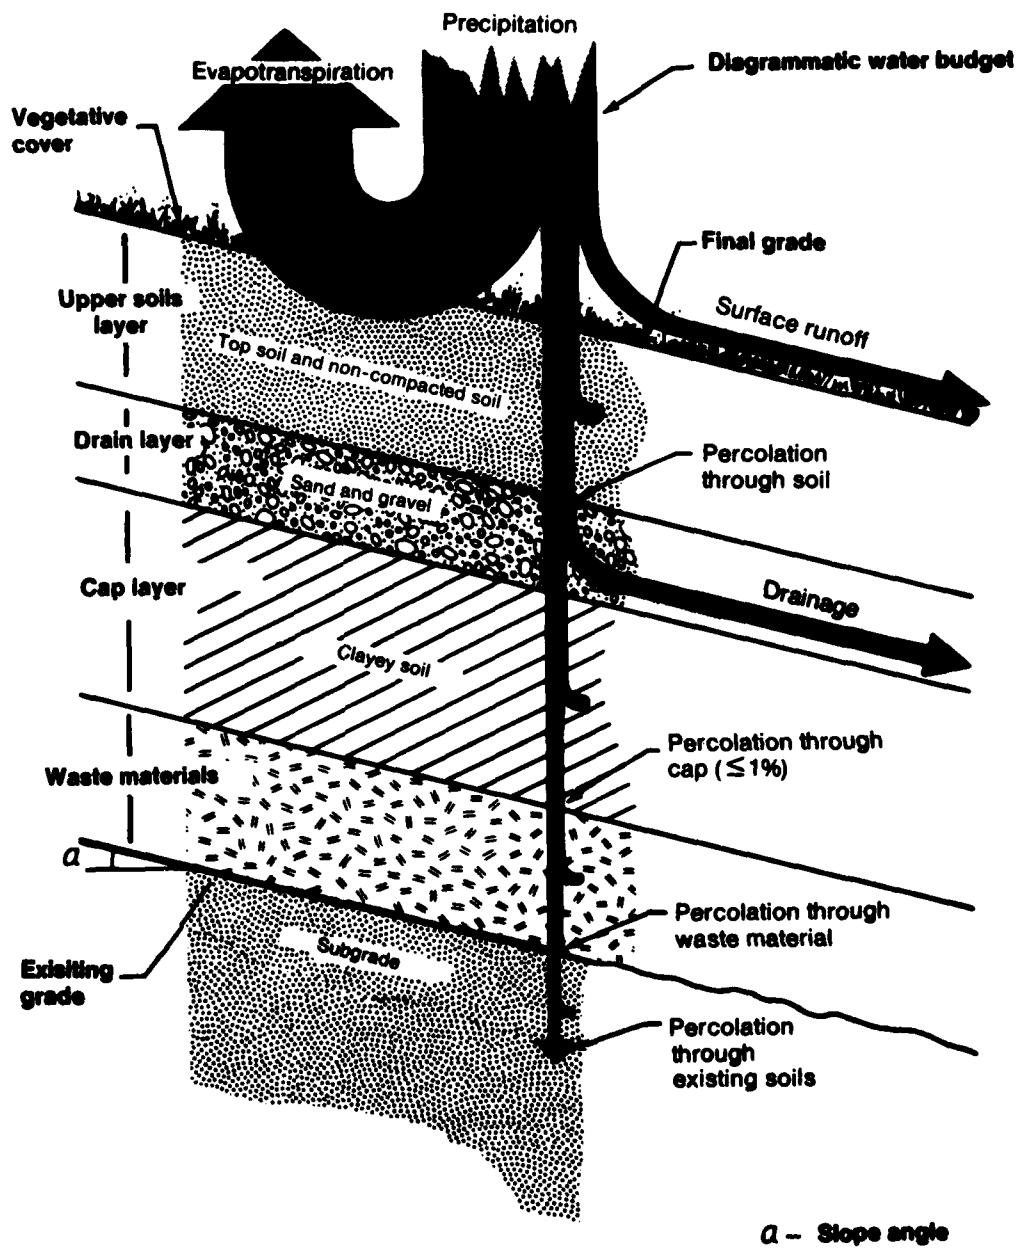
Profile of recommended encapsulation and cover configuration — Canoneburg UMTRAP site.
